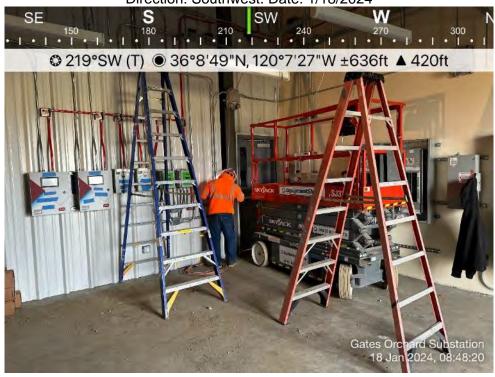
View of crews installing conduit outside of enclosure #1. Direction: West. Date: 1/18/2024
